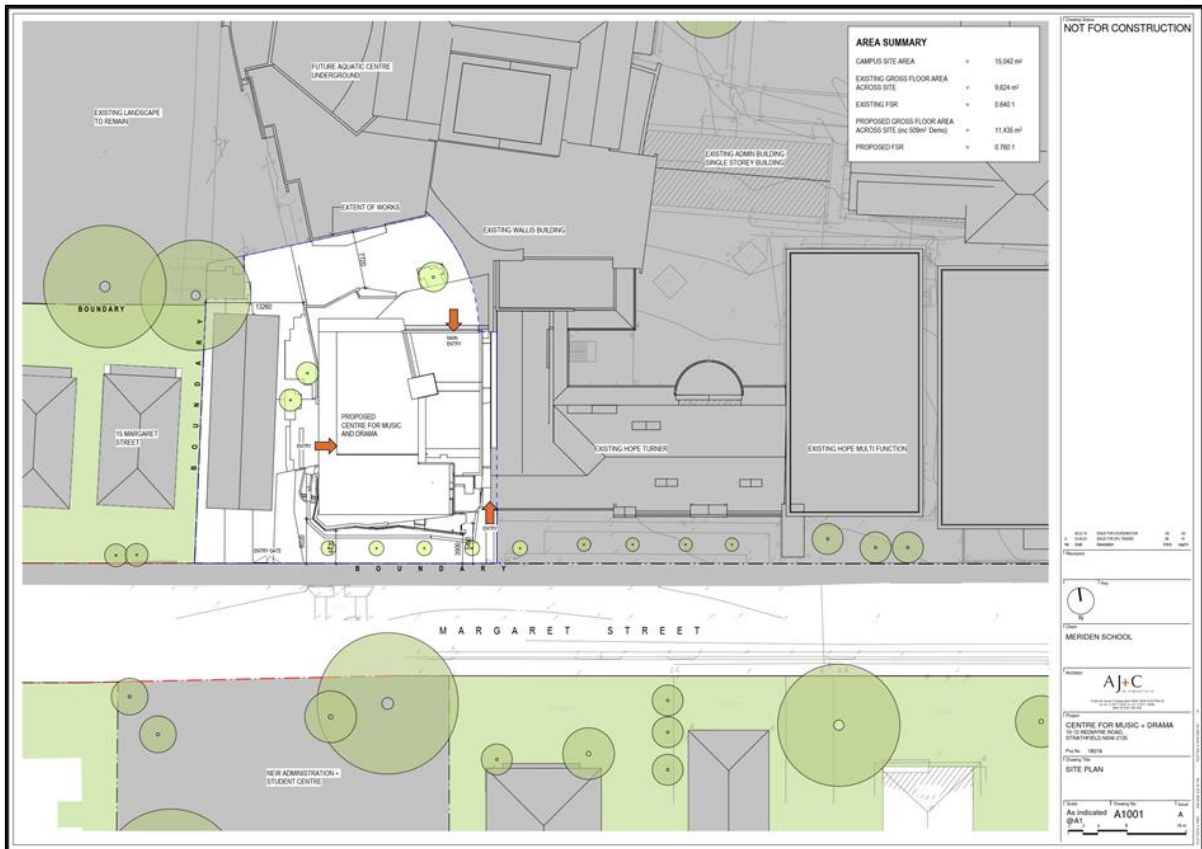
Senior Campus Centre for Music and Drama Layout (Site Plan)
